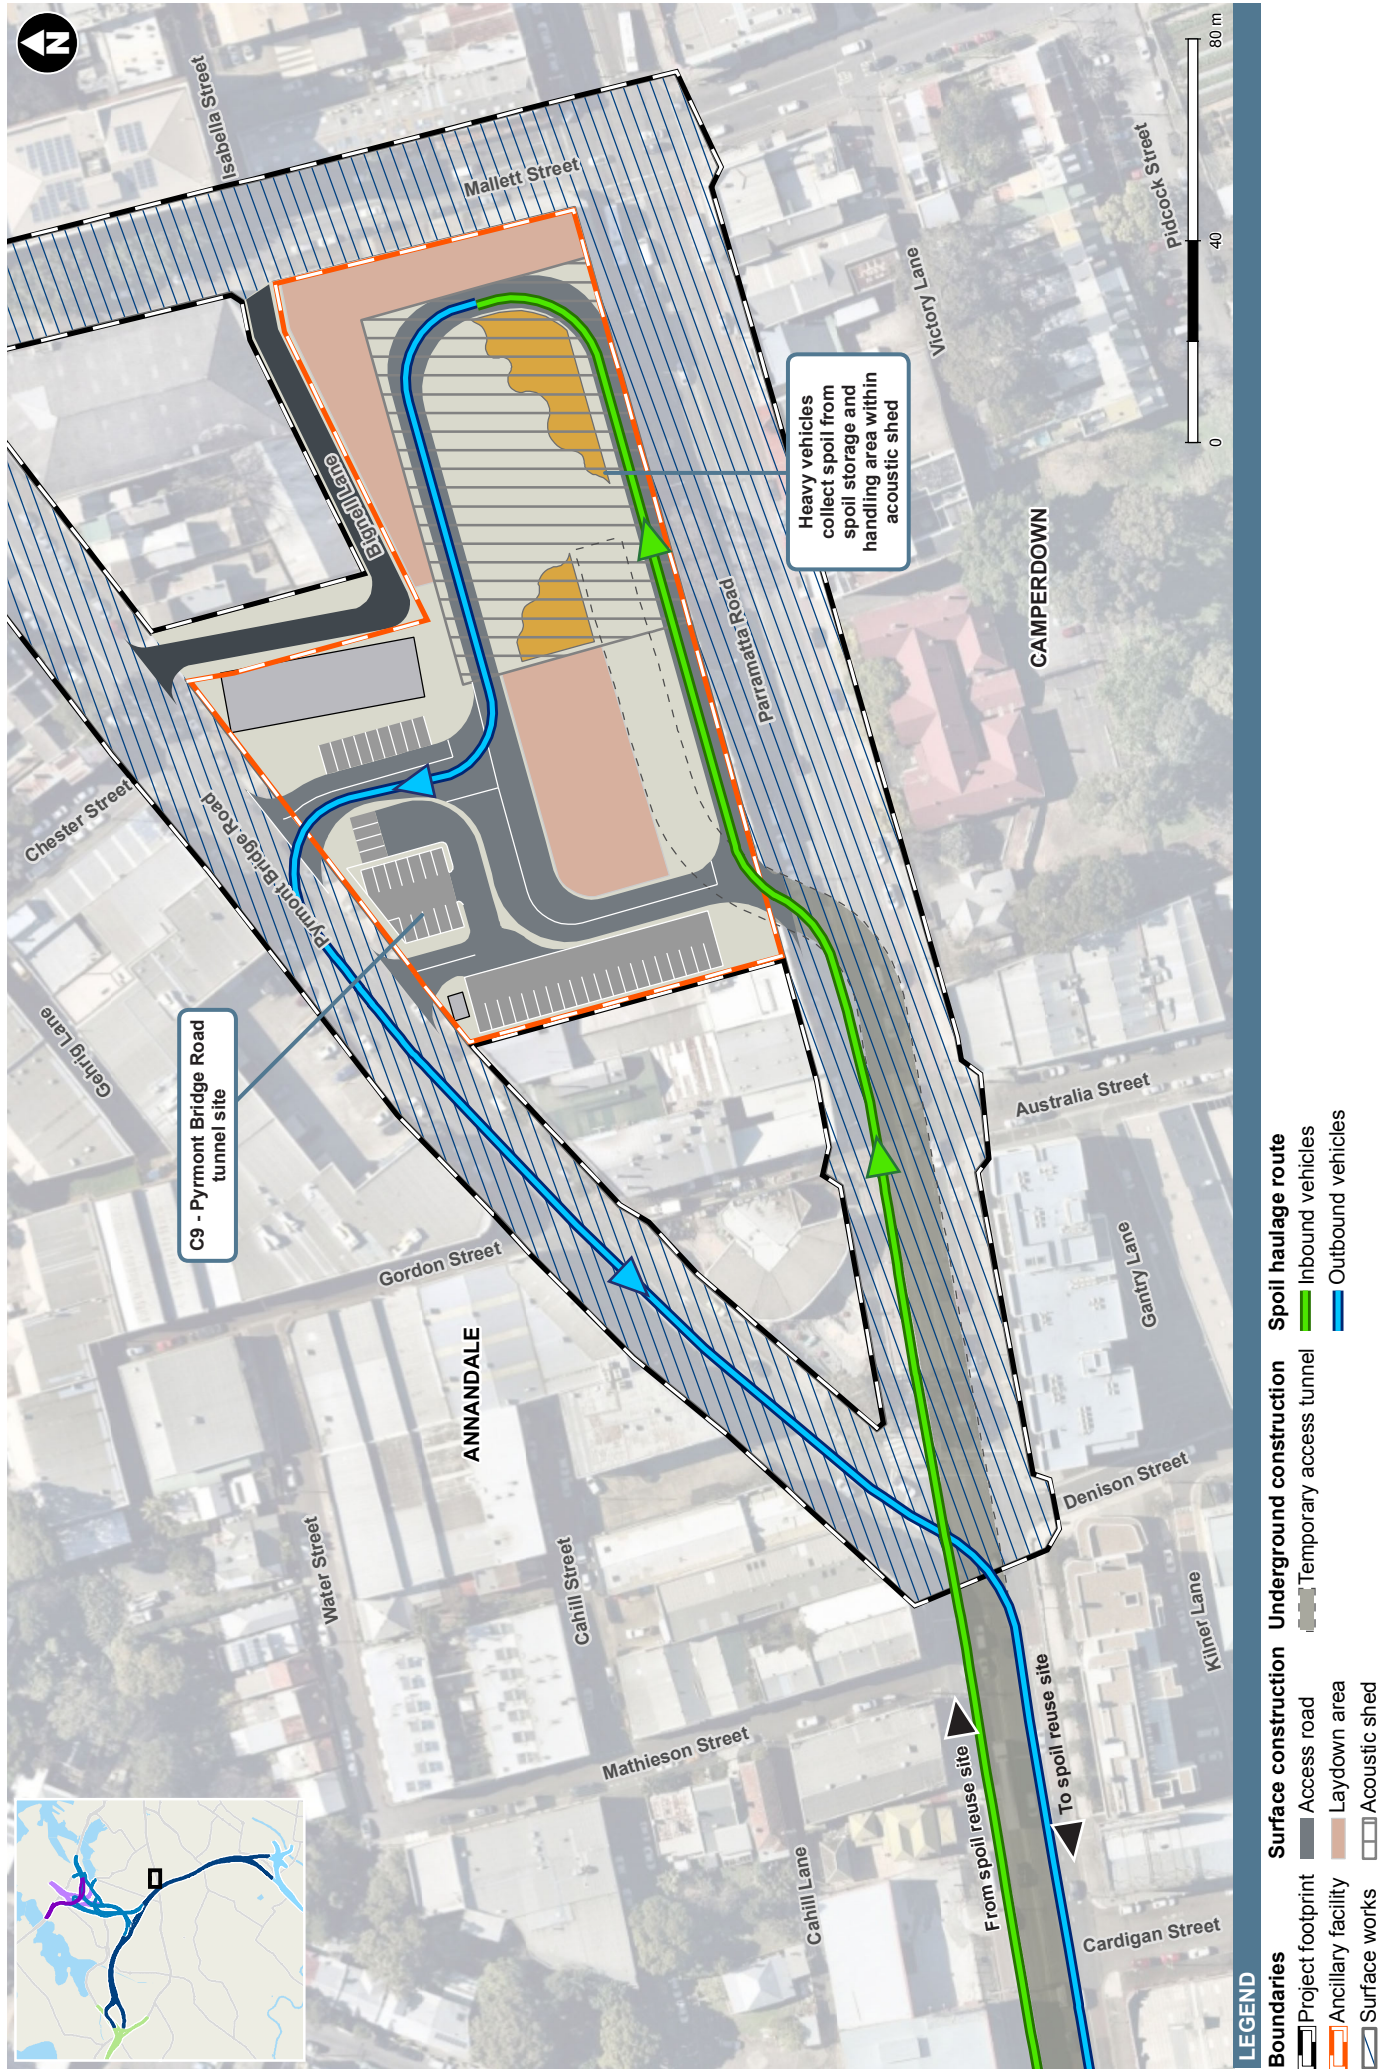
Indicative spoil haulage route – Pymont Bridge Road civil and tunnel site (C9)
